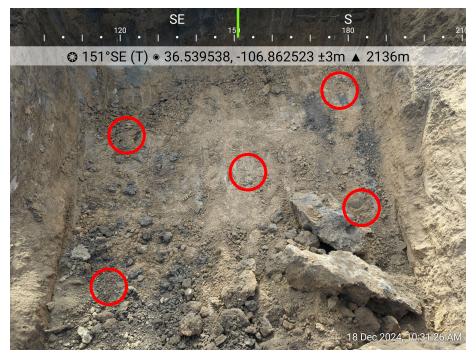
SS06 collected as a 5-point composite sample from the base of wellhead excavation area.
